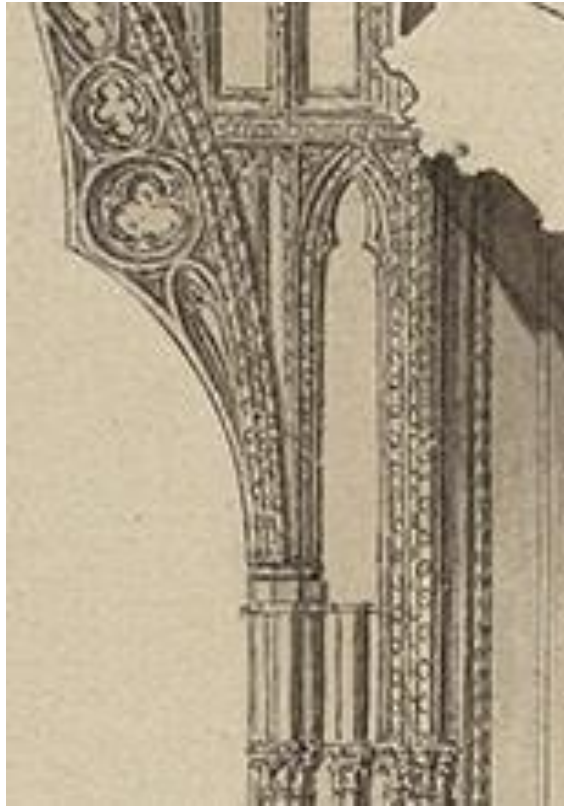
Detail of Plate 4. [*DRA 73 (Car)*].
